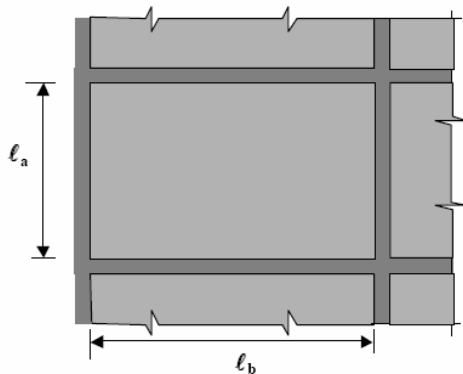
Edge panel with ℓ_a parallel to edge, of two-way slabs supported on girders, beams or walls
